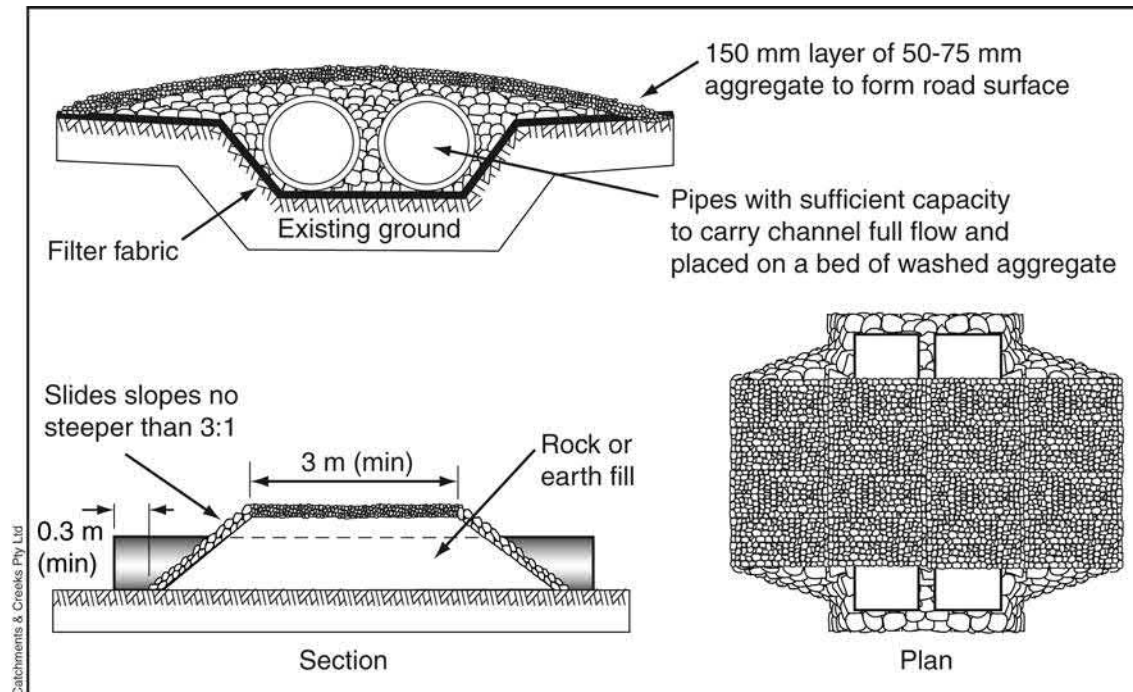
Preferred arrangement of temporary culvert crossing in a minor stream with low-gradient overbank (floodplain) areas
